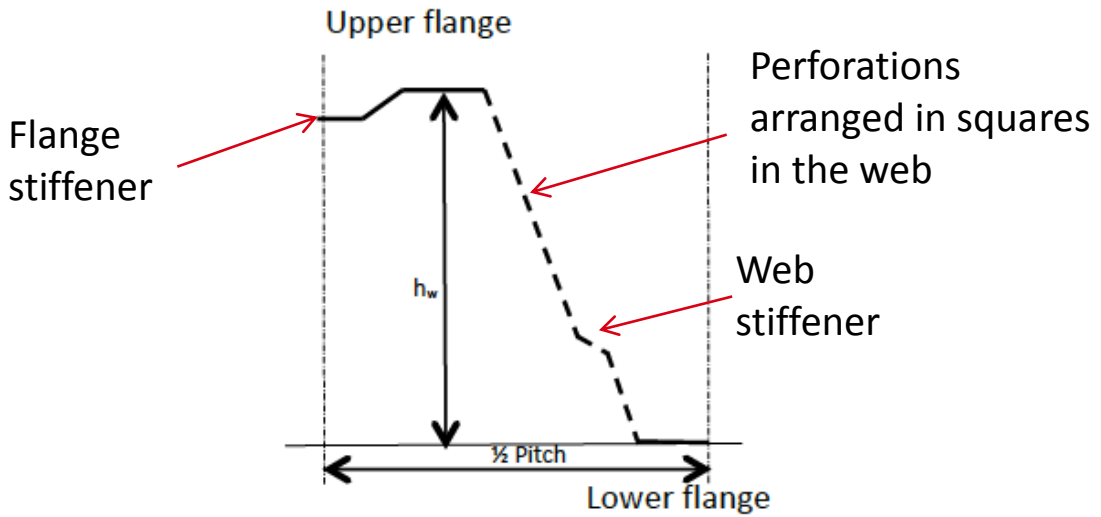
Steel sheeting with one stiffener in the flange, one stiffener in the web and perforations arranged in squares in the web.
